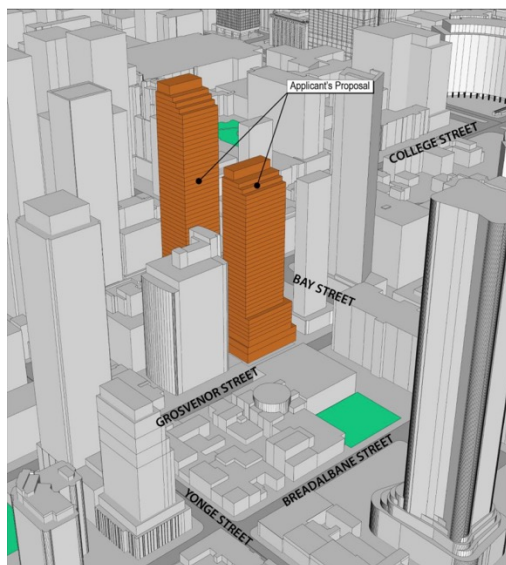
Applicant's official proposal for the development of 26 Grenville Street & 27 Grosvenor Street. Source: Bailey, 2019.
